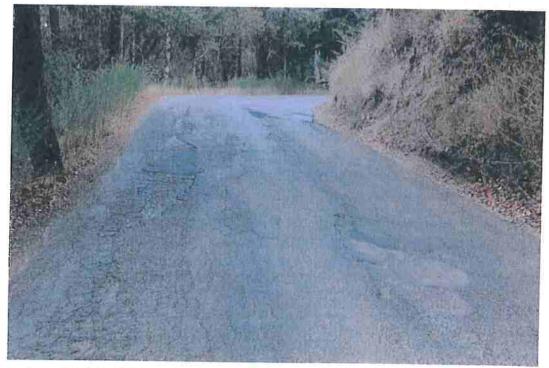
Mile 0.5: 18-ft road width with 1-ft shoulders.
